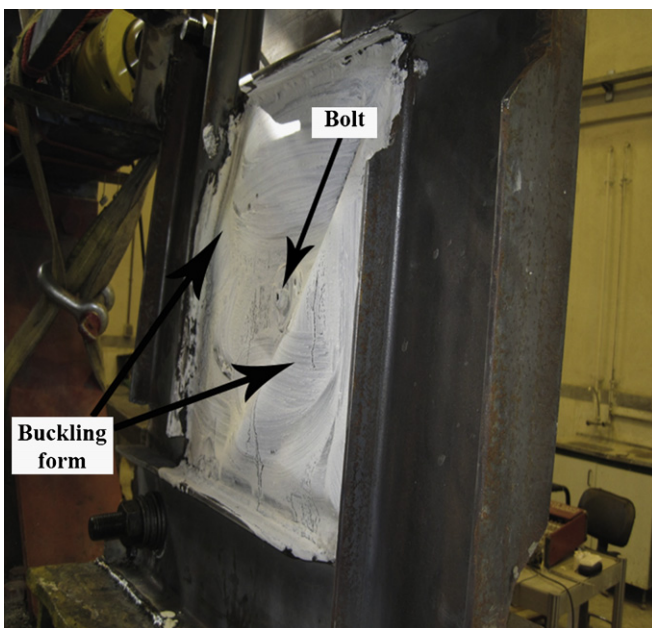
Steel plate buckling in the HC-5 specimen with 1 bolt.
